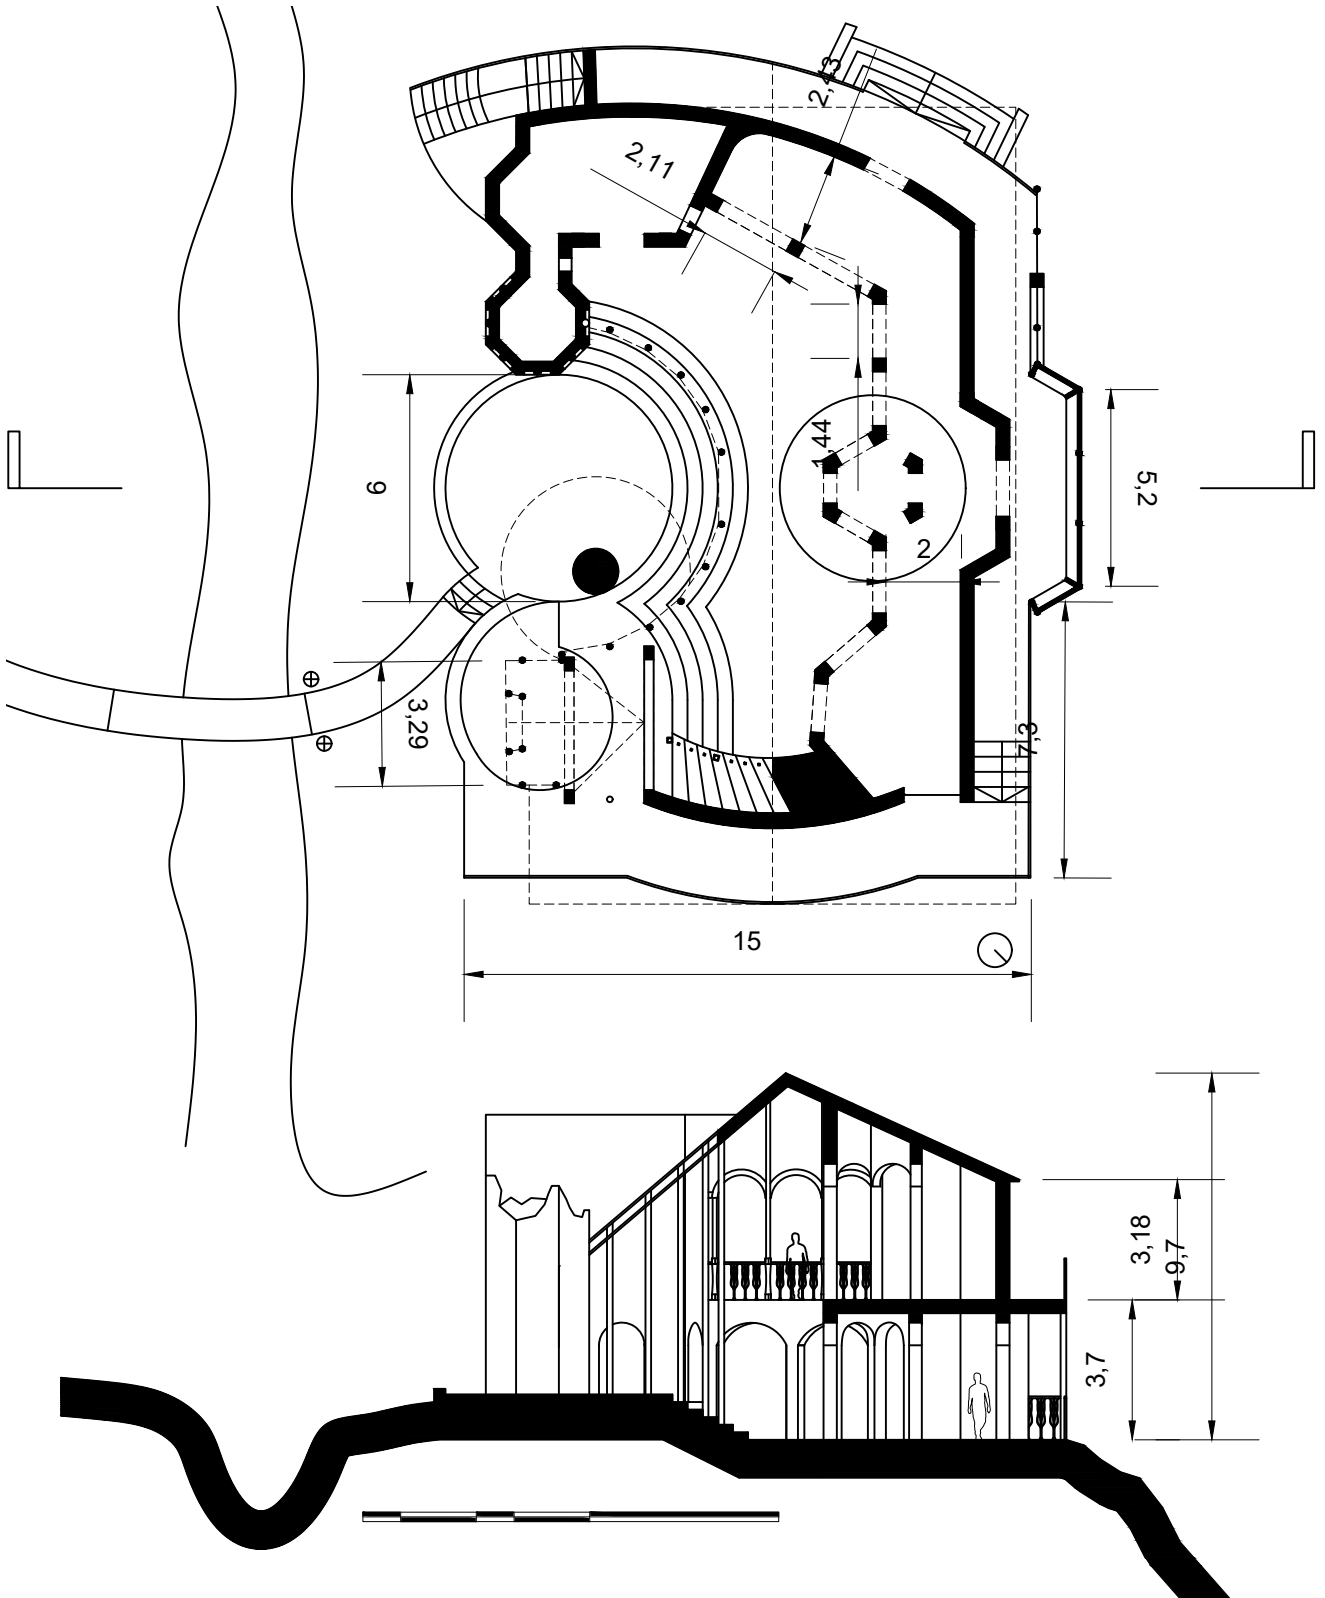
3d Groun floor & Trasversal section A4 1/200 Own Elavoration
